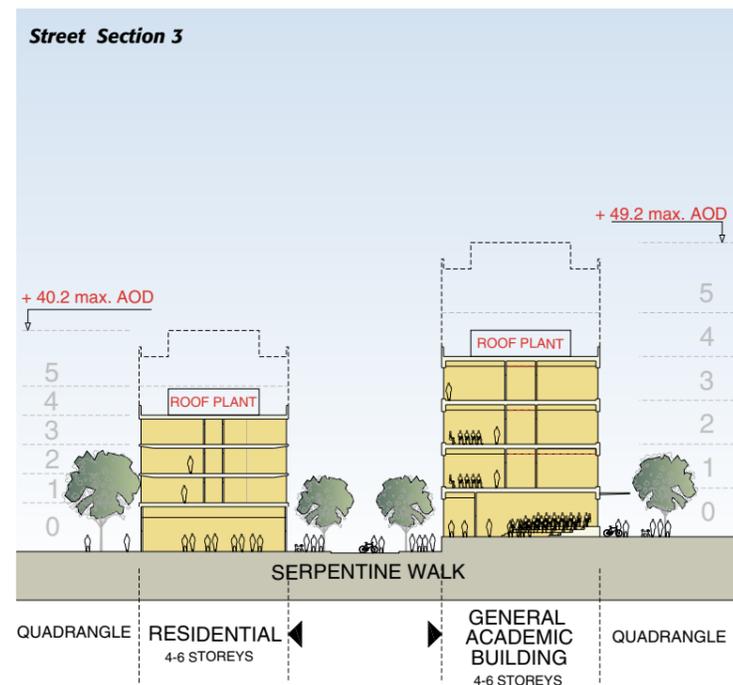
Section 3 illustrates a section along Serpentine Way through a 4-6 storey building (if in residential use) or a 4 storeys maximum building (if in non-residential use) and a general academic building of 4-6 storeys. Figure 4.10 establishes that the buildings will be a maximum of 39.5 and 49.2 metres above ordnance datum
